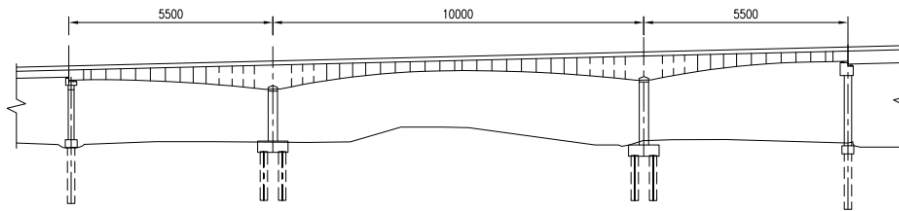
The elevation view of the Weihe grand bridge layout (unit: cm)
